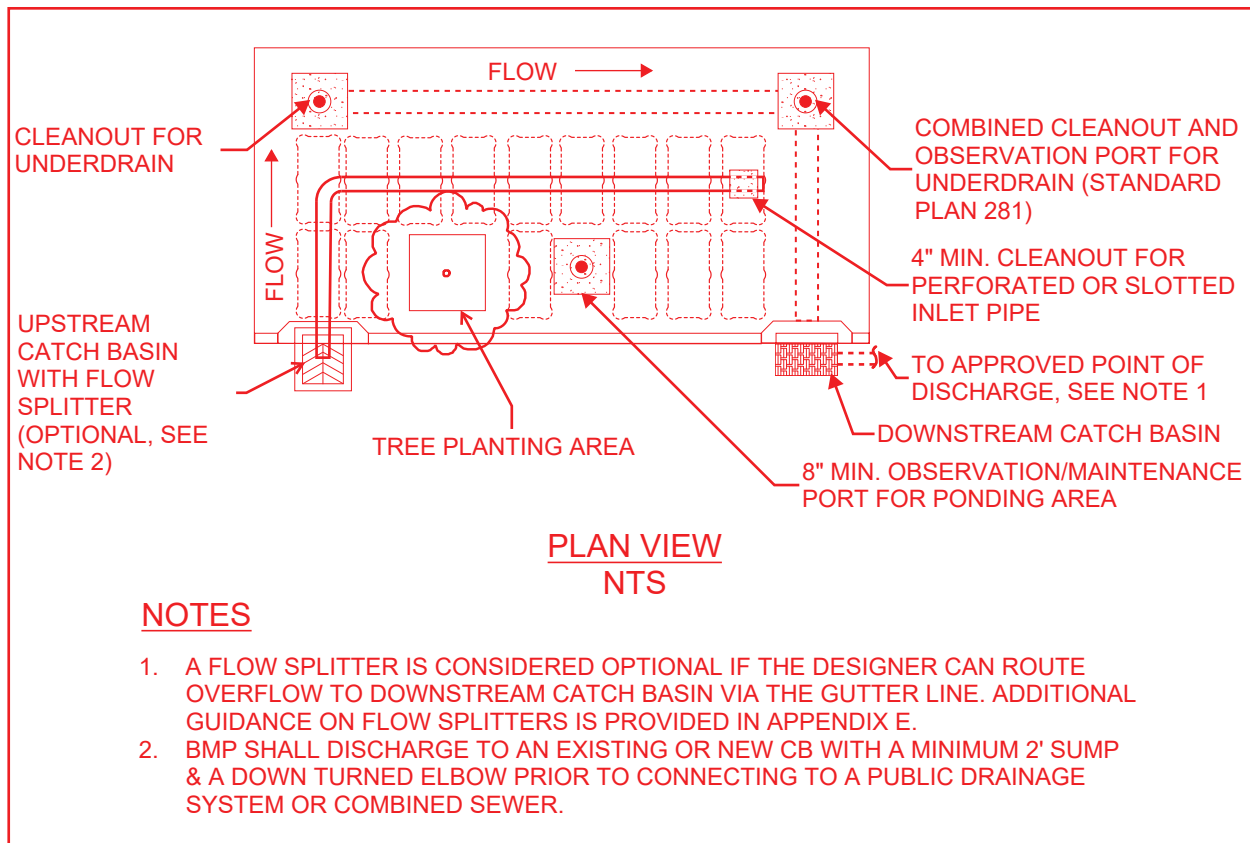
Infiltrating Soil Cell Bioretention (with Underdrain) Plan.
